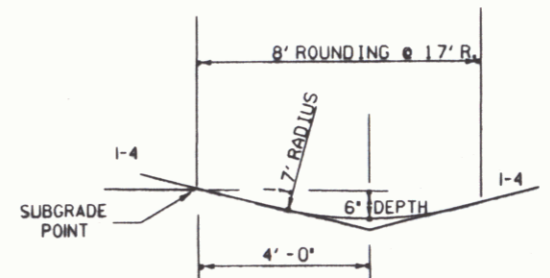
DETAILS OF DITCH AND BACKSLOPE FOR LOW SIDE OF BANK ≥ 0.042 FT/FT
